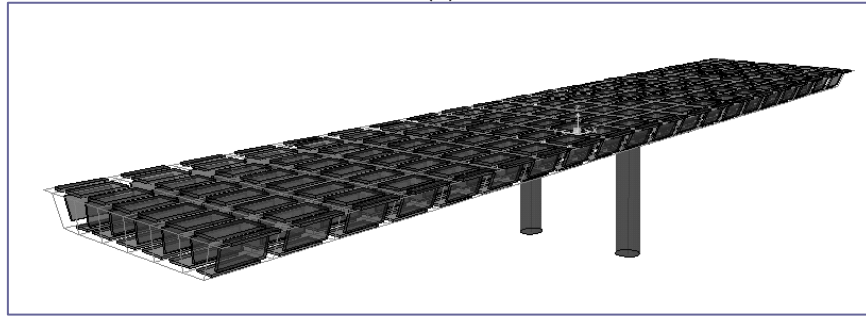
Elevation and sectional details of the Camino Del Norte Bridge
